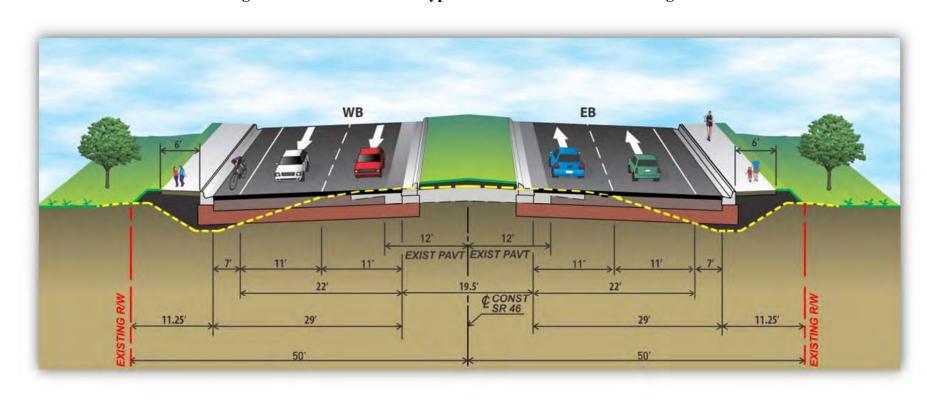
Revised Urban Typical Section – Centered Widening
